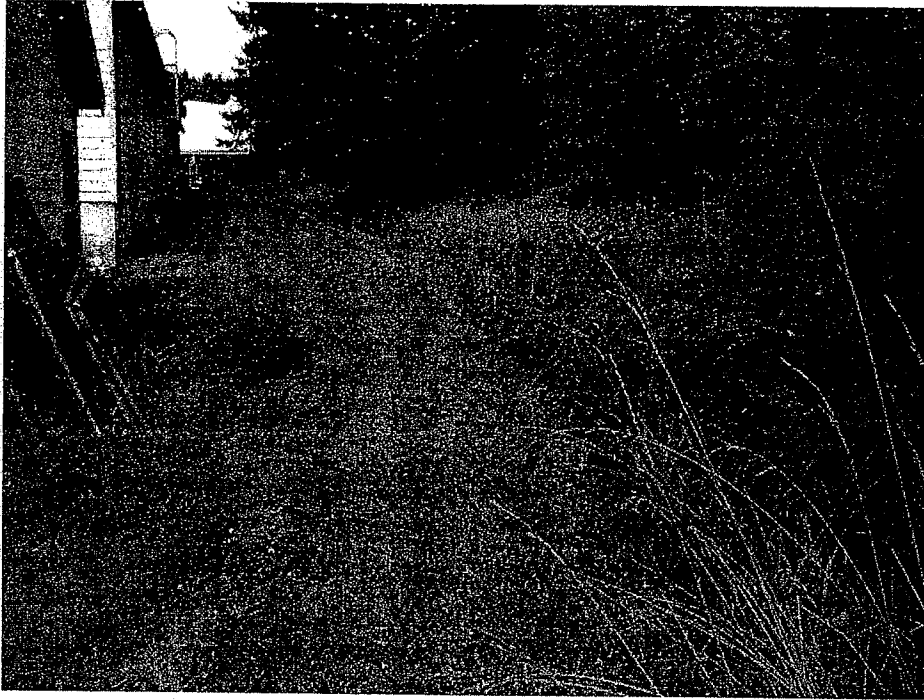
Area B facing upstream. The existing channel is an abrupt, grass-lined ditch. Again, notice the close proximity of the existing buildings (taken on 9/17/08).
